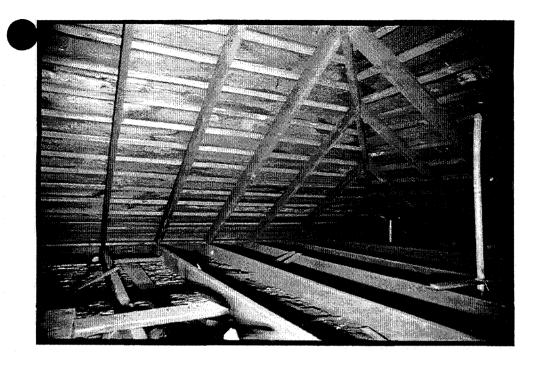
ROOF FRAMING AT THE 1874/1879 ADDITION
